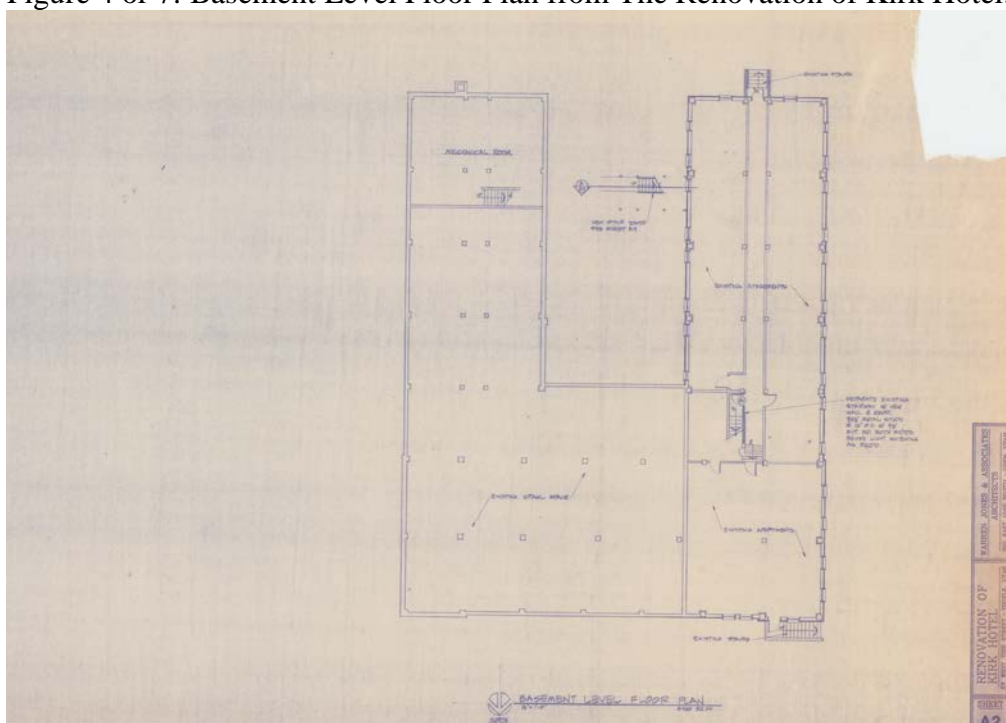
or 7: Basement Level Floor Plan from The Renovation of Kirk Hotel.
